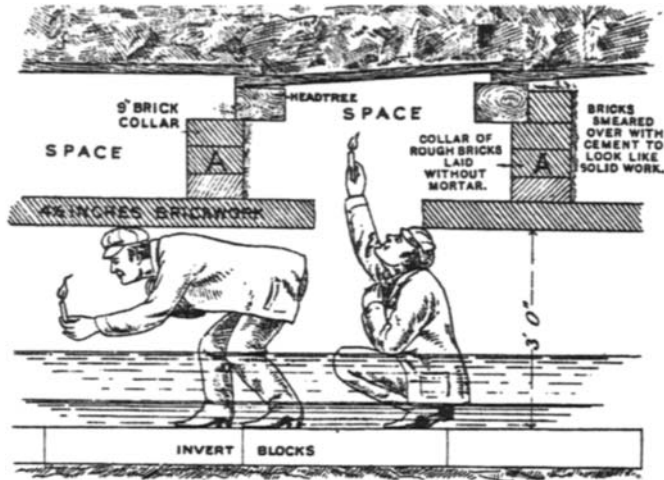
Main outfall sewer, Manchester, under construction.
